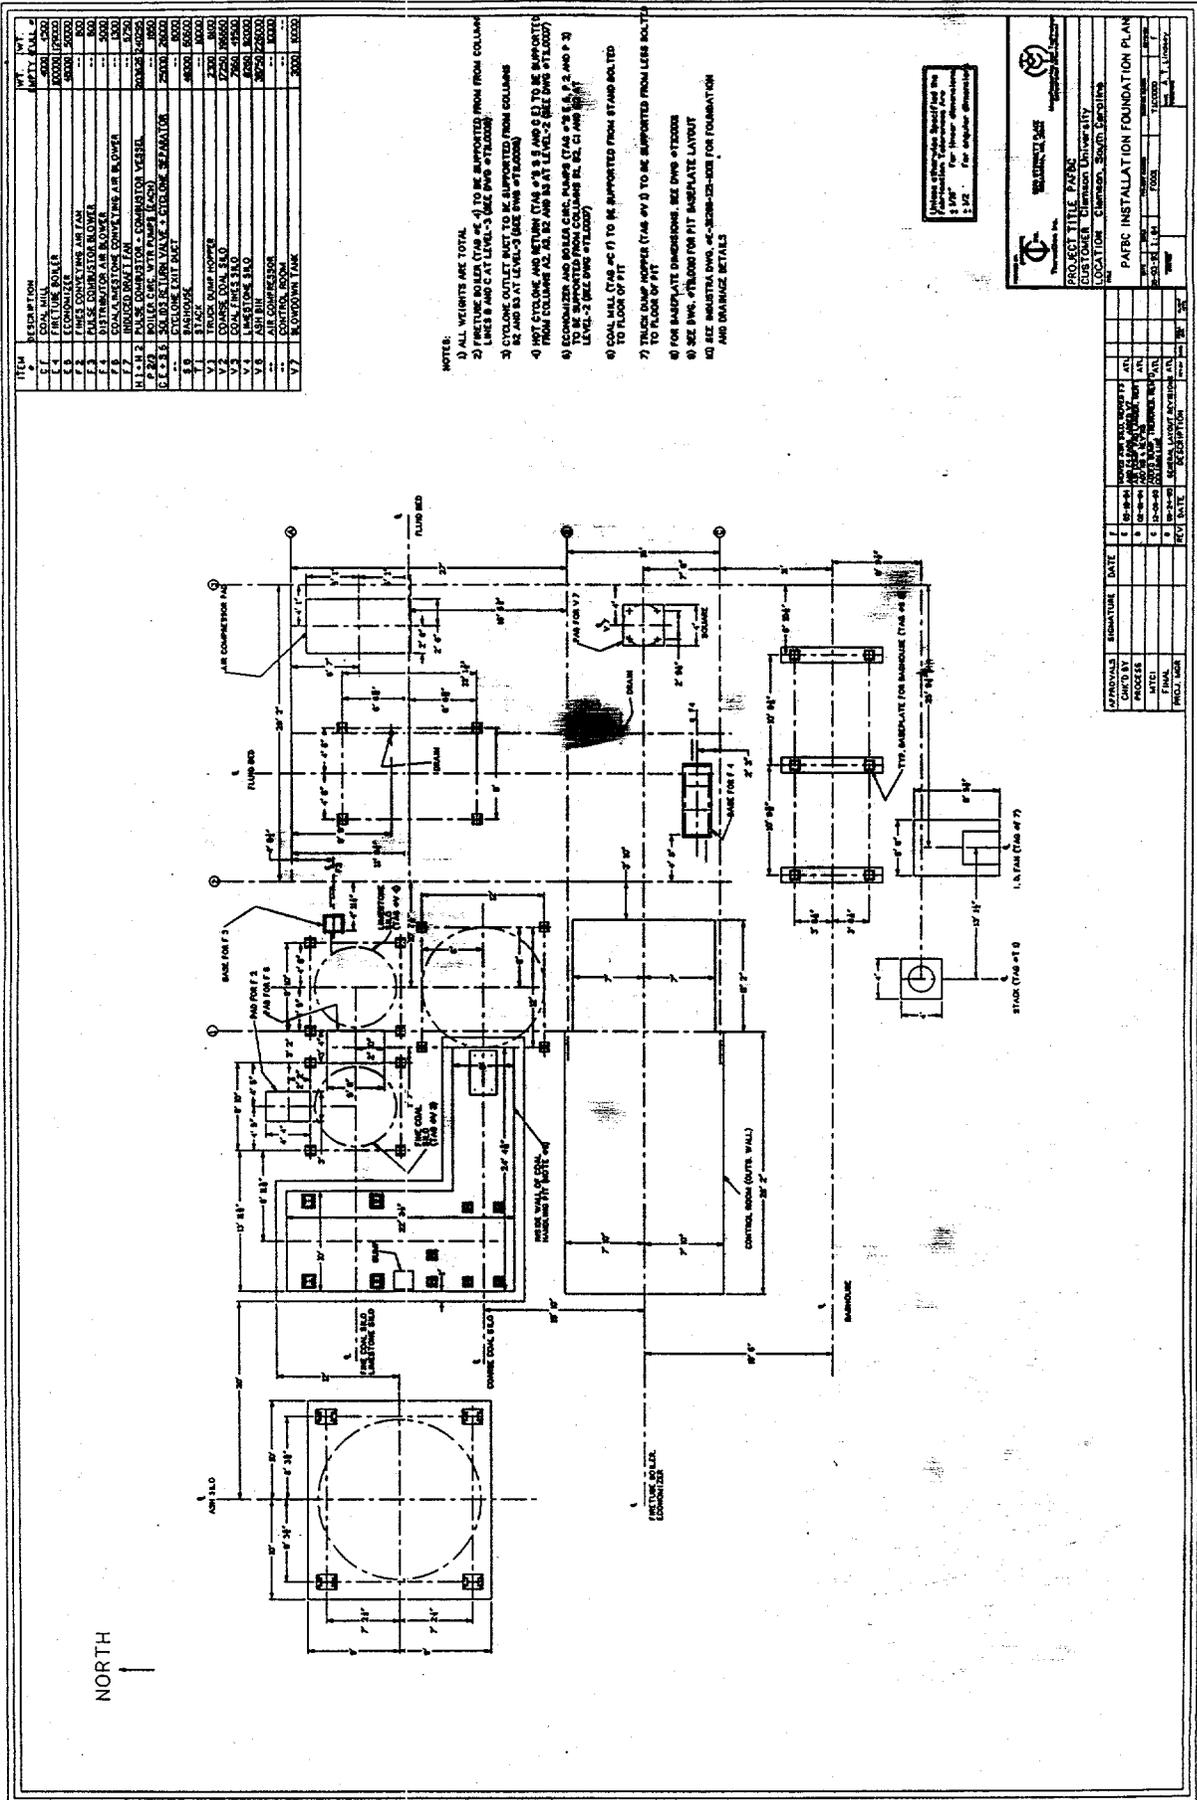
PAFBC INSTALLATION FOUNDATION PLAN
